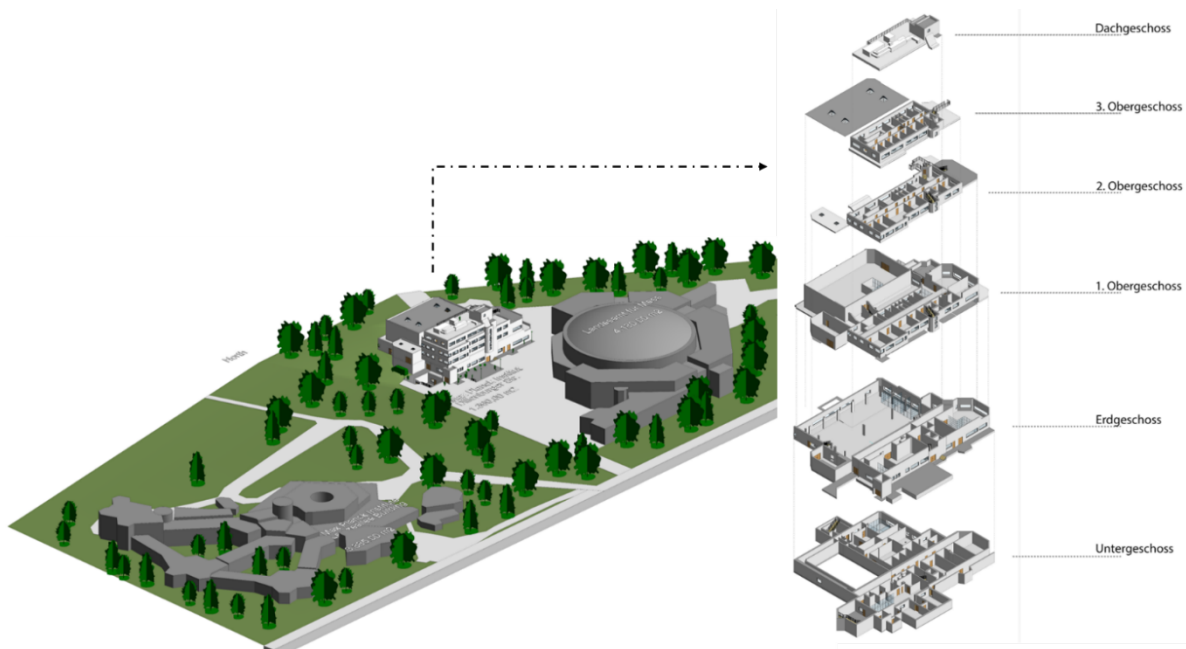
BIM Site Model Showcasing Dillenburger Strasse Building (Building 2), Source: By Authors
